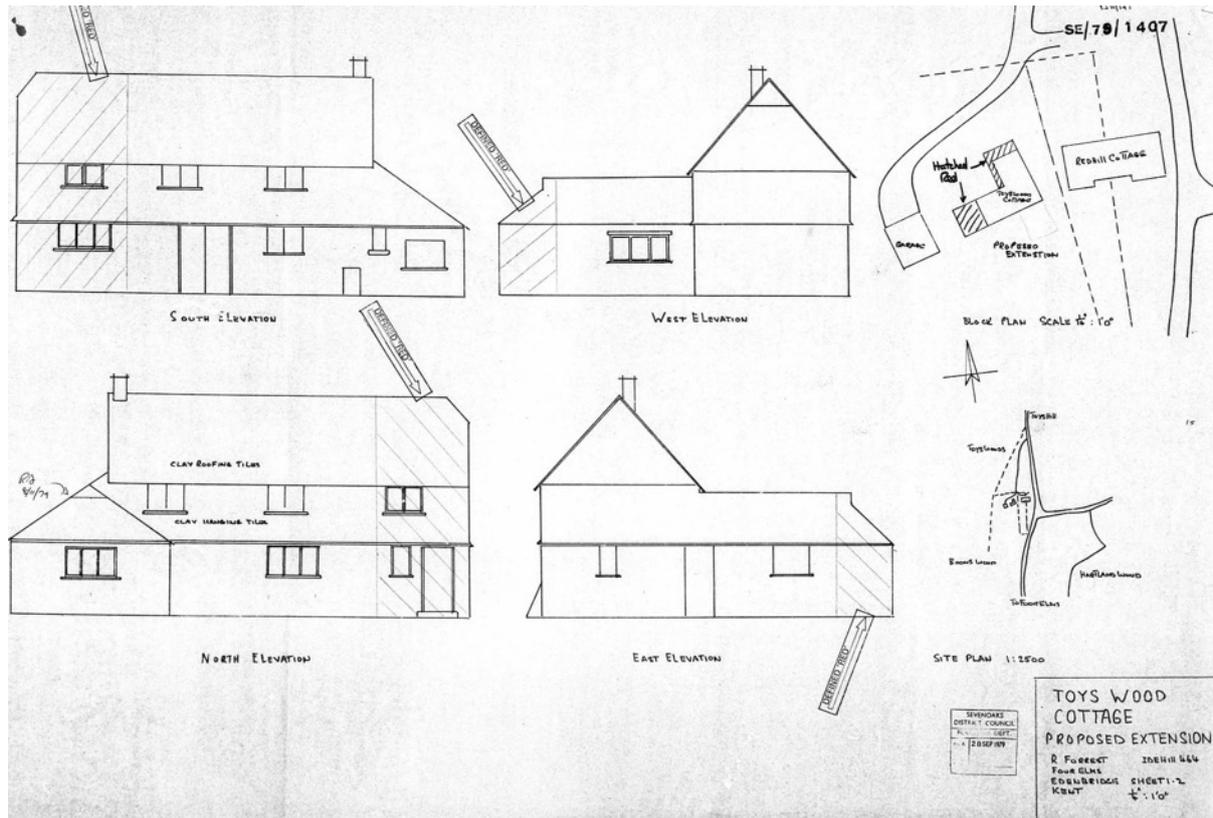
1979 LBC plans (Sevenoaks DC planning ref. 79/01407/HIST)
